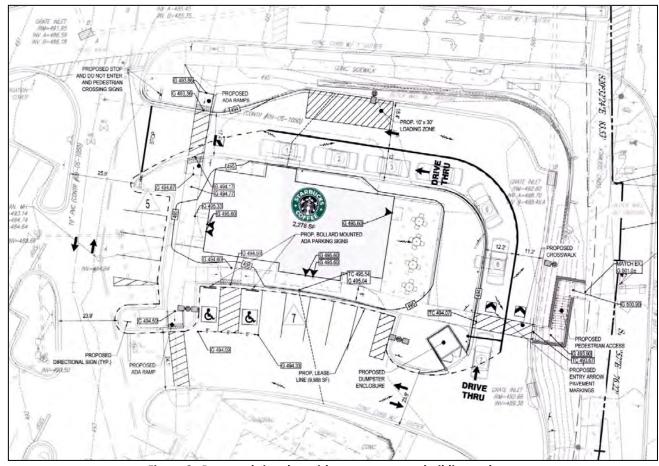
Proposed site plan with new restaurant building and existing building pad, drive-thru lane, and parking.
